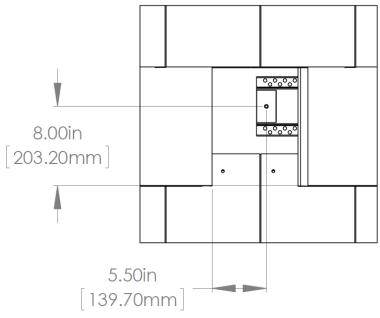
Flat Tile Installation with Base Plate (Rafter East Orientation Shown) Layout Dimensions Same in East or West Rafter Orientation
